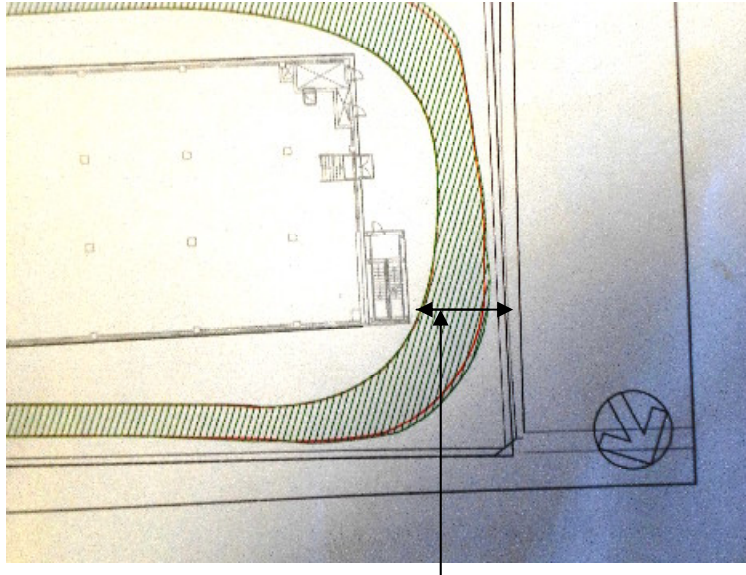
Distance from corner of stair to edge of concrete approx 6700mm.
